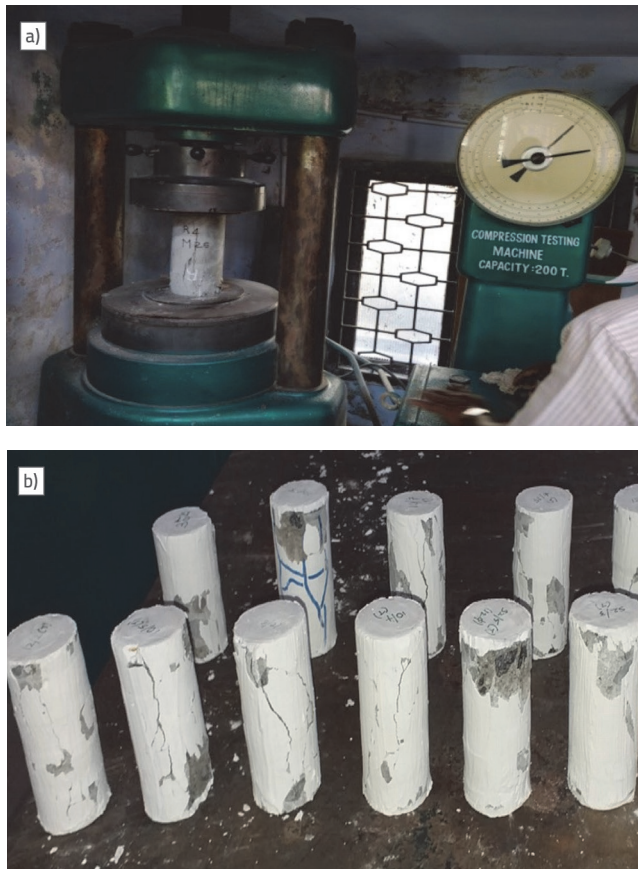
a) Specimen fails after application of load; b)Cracks after specimen failure
